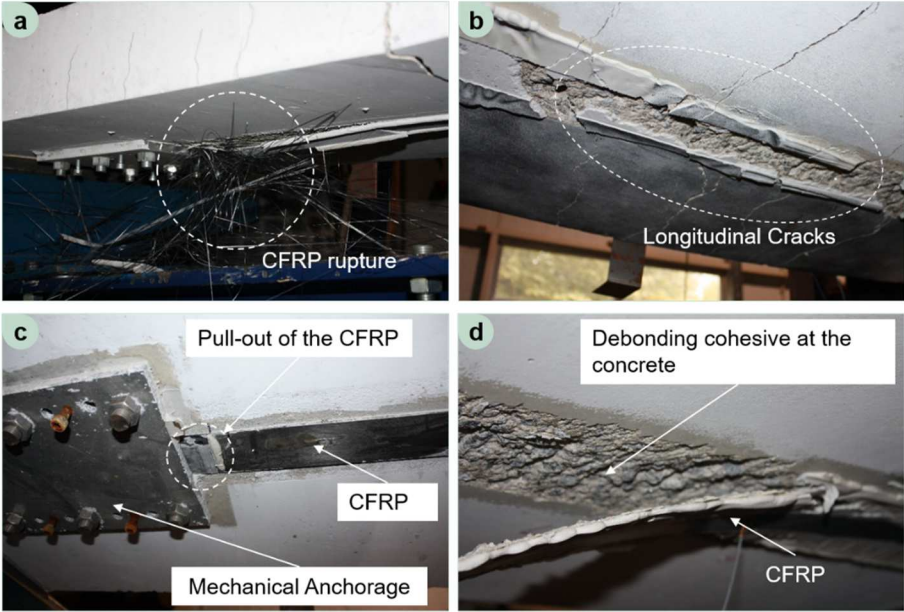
Failure modes: (a) CFRP rupture in unidirectional tension (MA_REF_T0); (b) observed longitudinal cracks at the epoxy region (GA_TW_C); (c) CFRP strip pull-out from the mechanical end/anchorage (MA_WD_C); and (d) detail of a cohesive at the concrete debonding (GA_WD_U).
